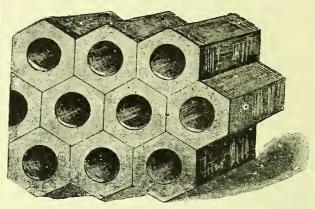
WALL WINE-BIN, CONSTRUCTED OF KING'S CELLULAR BRICKS.
